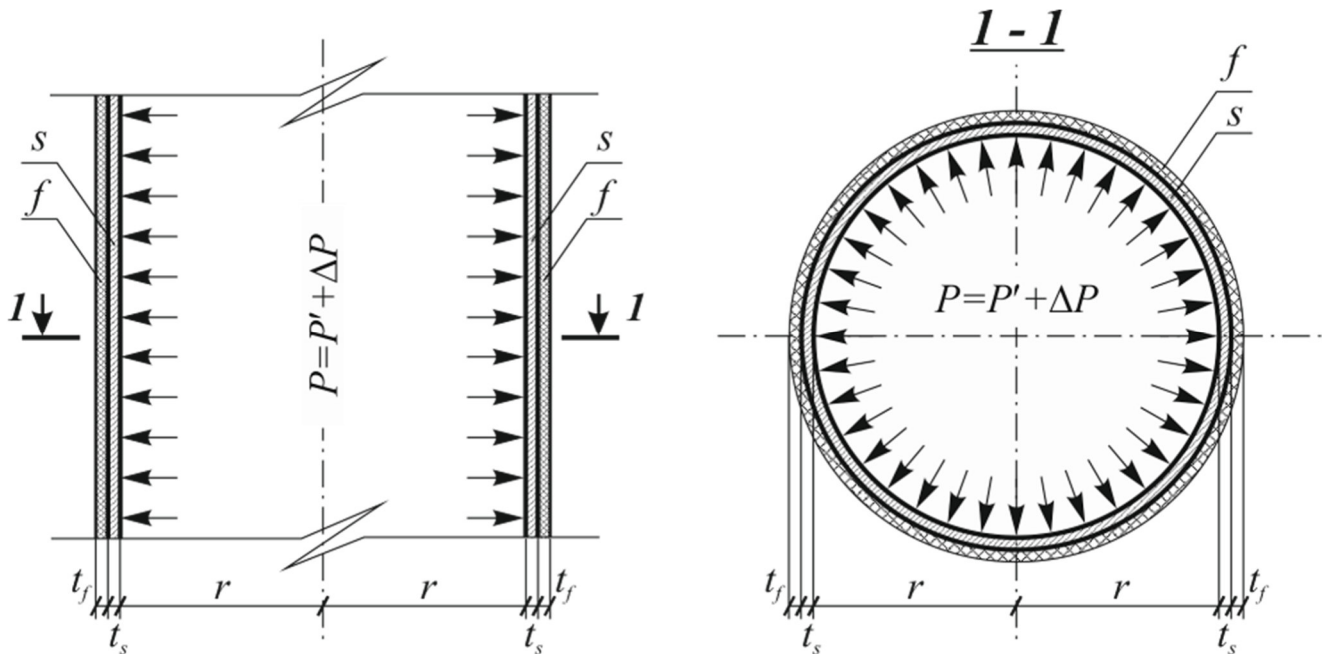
Calculation drawing of a steel cylindrical shell of a tank reinforced with external transverse FRP: s – the steel shell of the tank, f – the layer of external transverse FRP reinforcement
